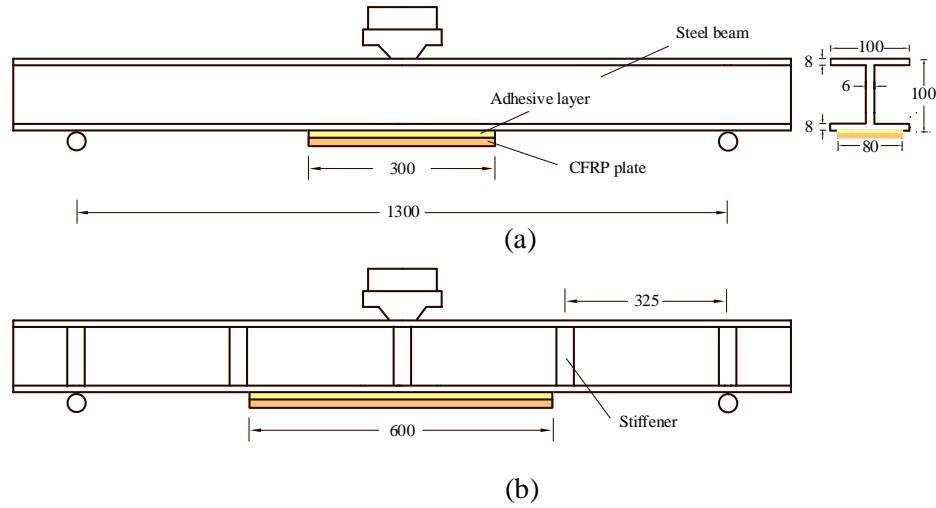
Schematic of CFRP-strengthened steel beams: a) BP300; b) BP600.
